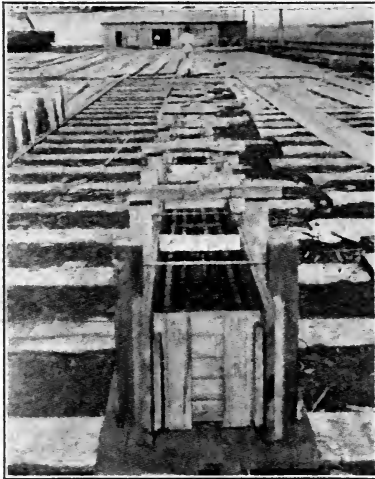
Forms and reinforcing steel—Pennsylvania R. R. concrete poles.
